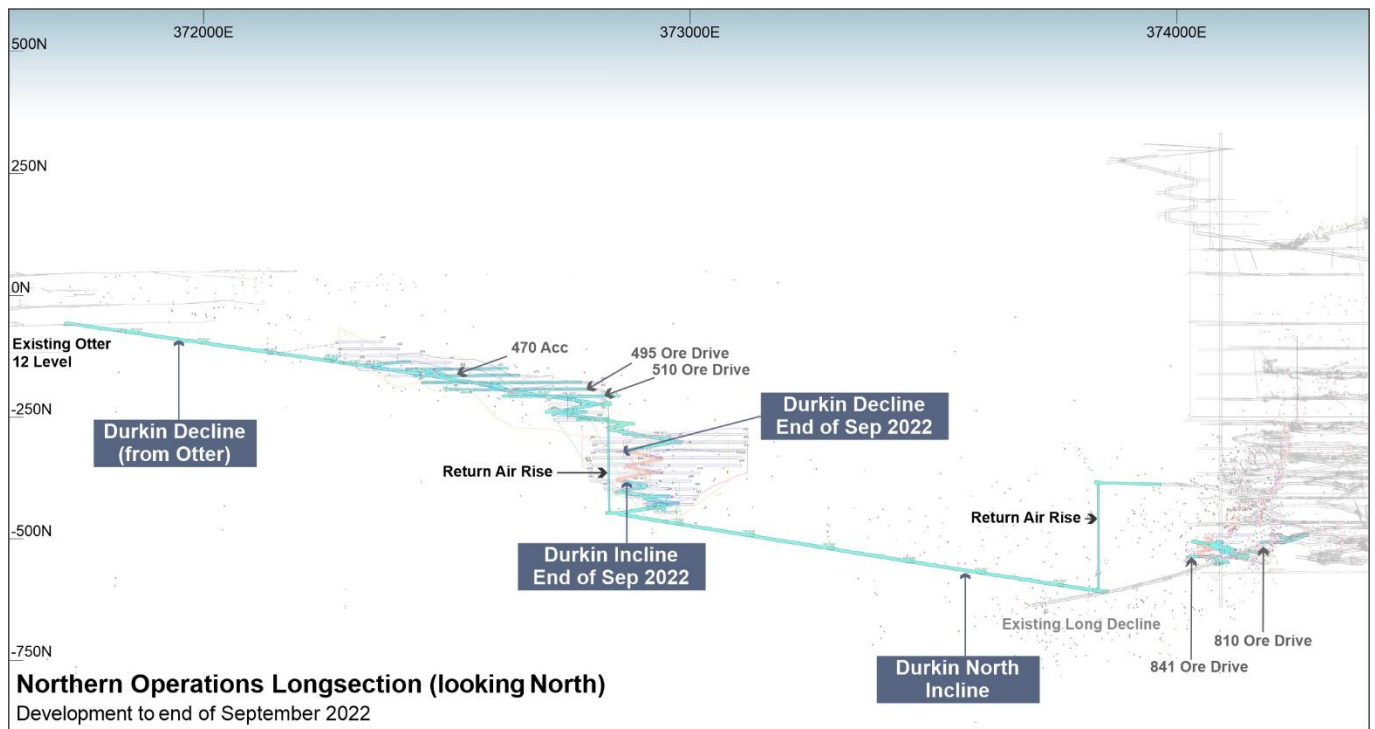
Durkin North Mine Plan Design (Long Section Looking North). Development as at 30 September 2022
